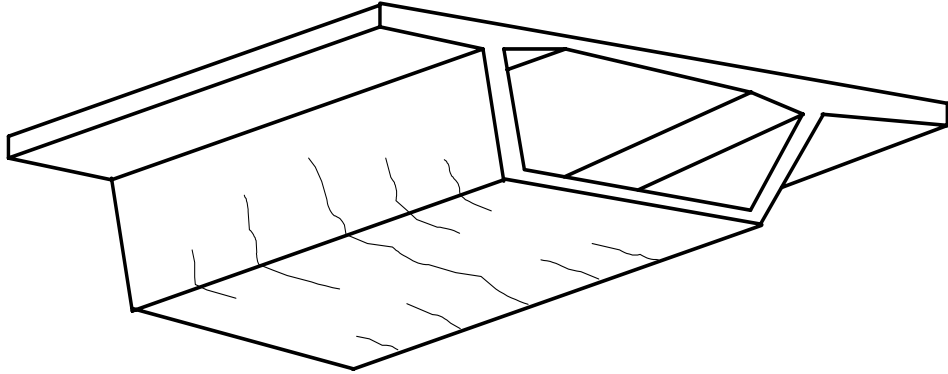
Box Girder Cracks Induced by Flexure (Positive Moment)
